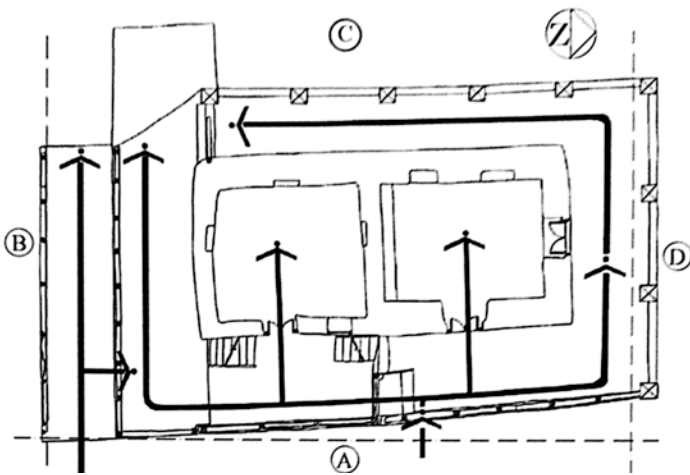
Circulated paths in the plan of Amini house; first floor (Taleghani 2010c)
